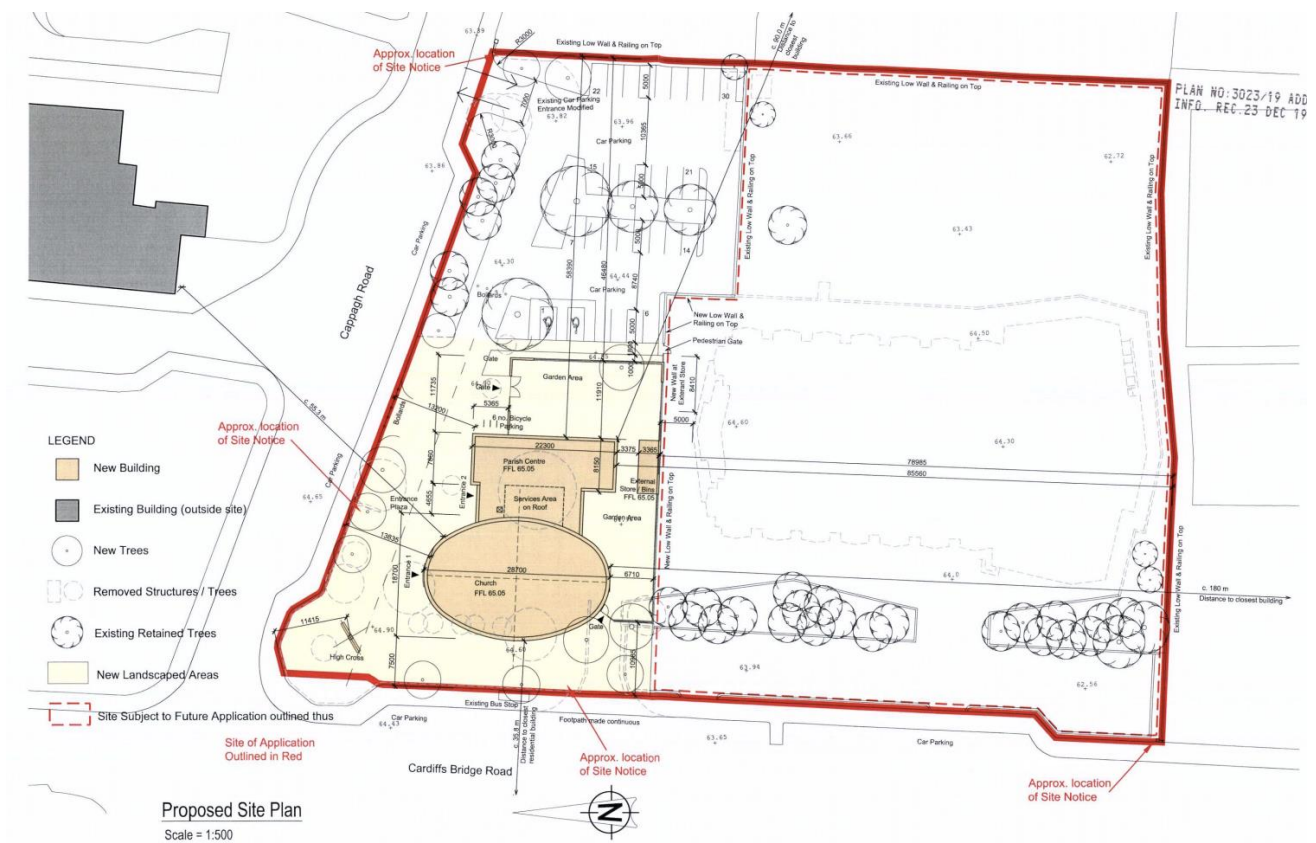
Permitted Site Plan (Source: Walsh Associates as displayed on the DCC planning register)
